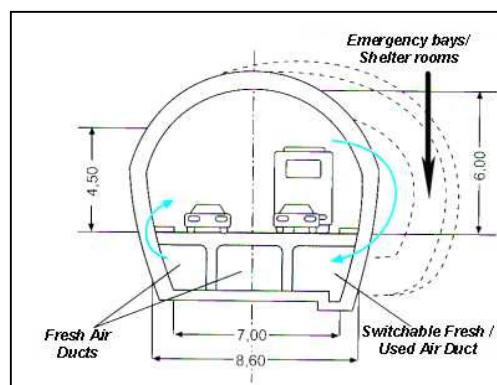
Cross-sectional area of the Mont Blanc tunnel.
